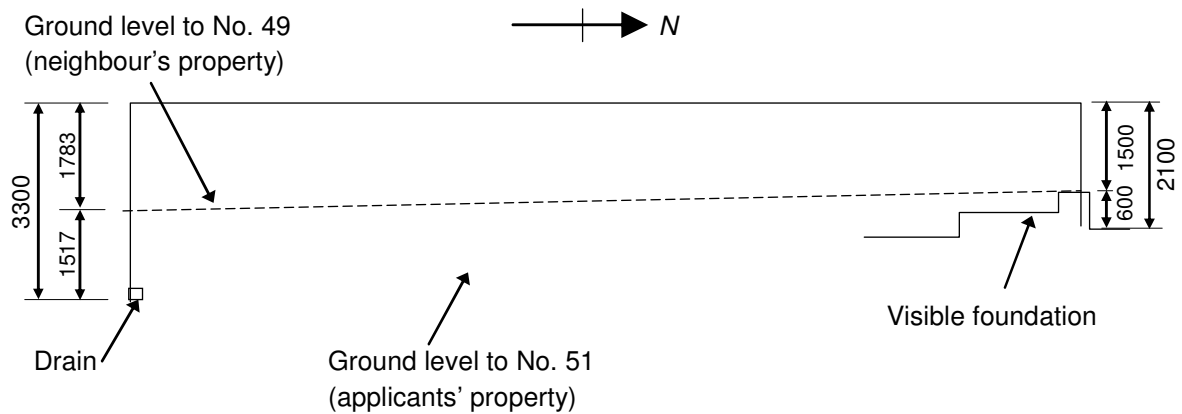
Elevation of the wall looking towards No. 49 (not to scale)
